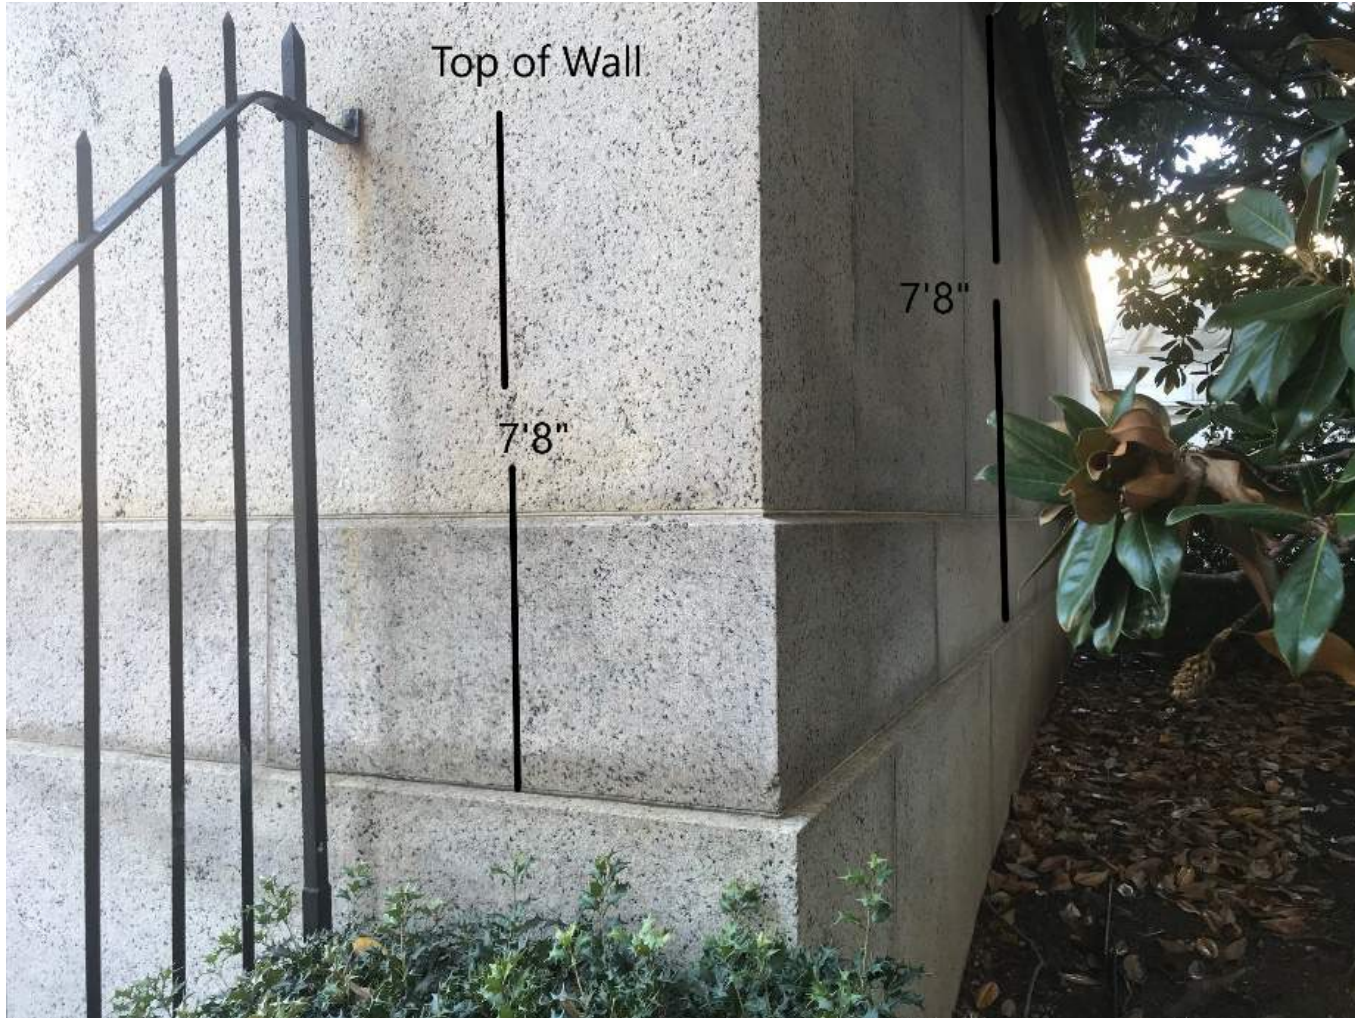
'8" Measurement of Granite Wall And Stone Column Above Concrete Platform
